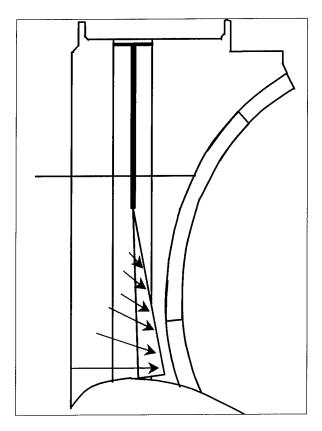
Cross section of a spill bay showing a pipe mount and transducer beam.
